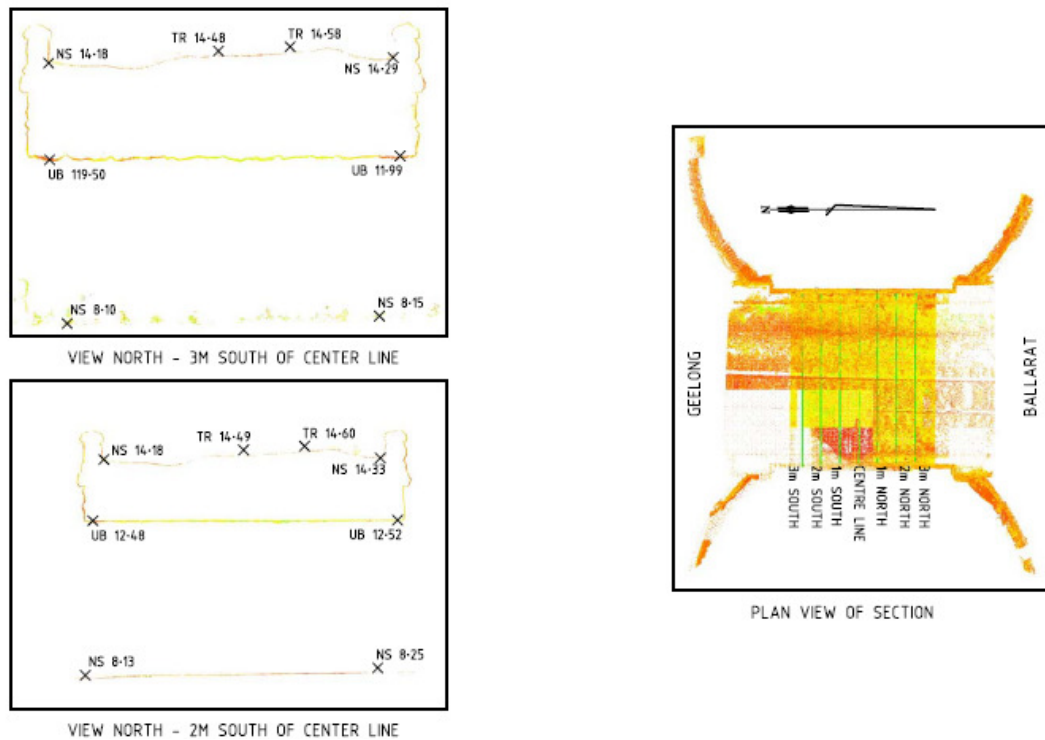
sectional analysis plans (example) of existing bridge conditions used for developing precast concrete liner.
